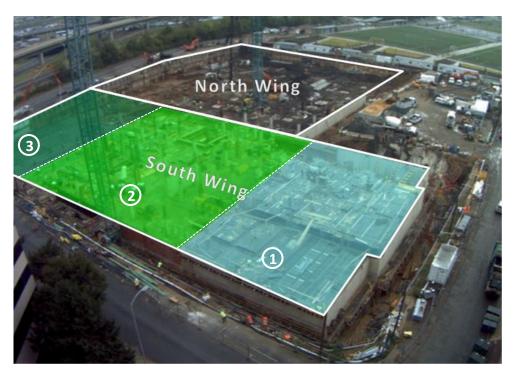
Concrete Floor Sequencing Pours (Courtesy of Davis webcam)
